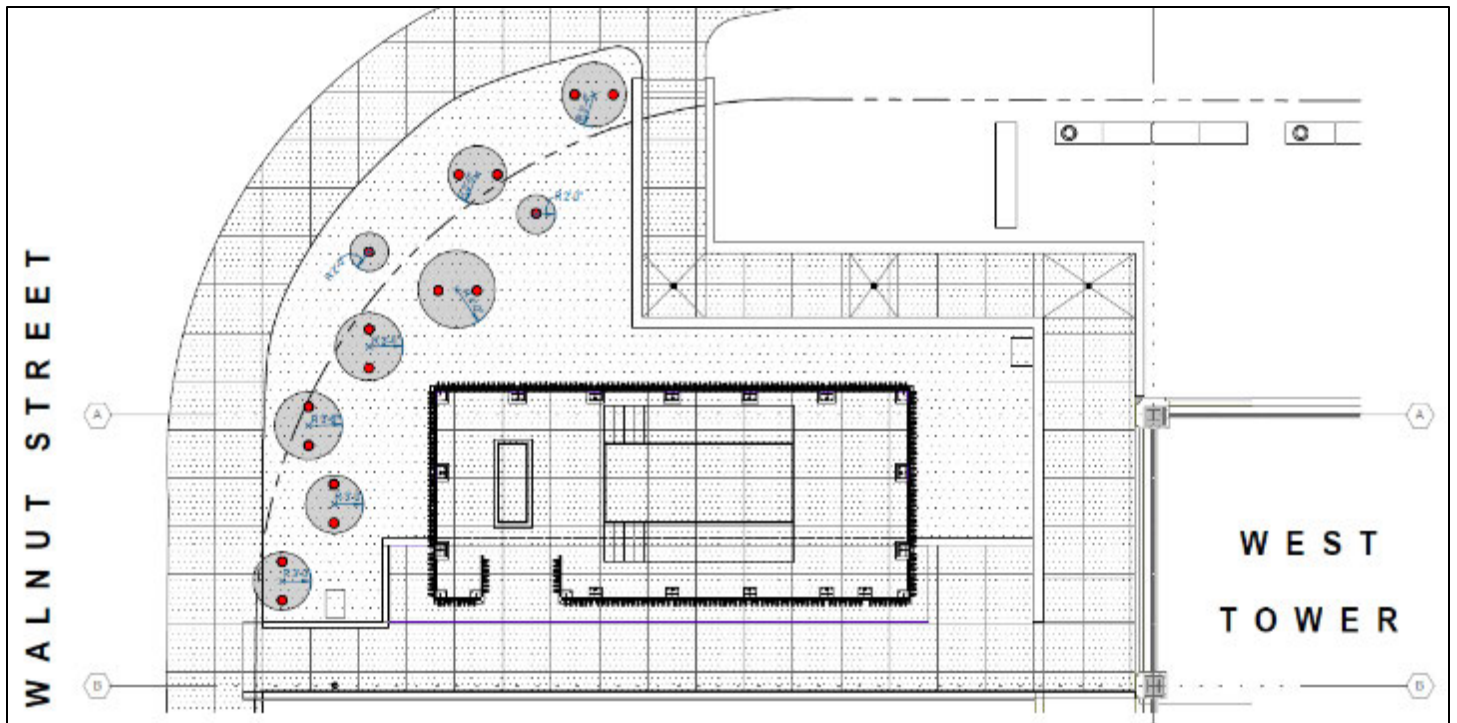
Plan view of proposed bollards at the corner of Walnut Street, near the KOC Emergency Generator.
